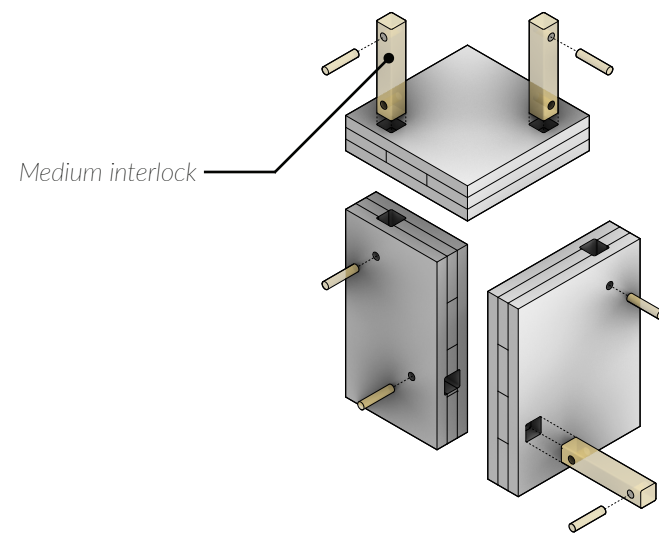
60. Exploded isometric view of joint type C (medium interlock)
